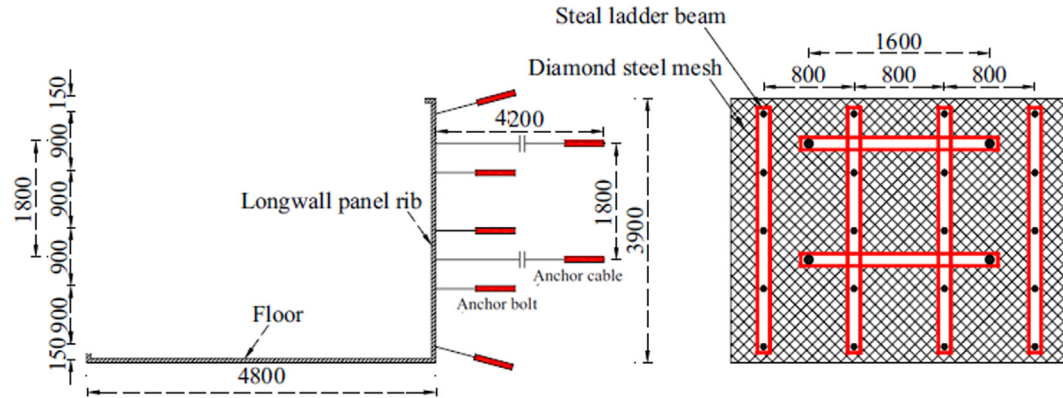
Case 1 – Longwall Panel Rib Support Plan (Bai et al., 2019) (Unit: mm).
